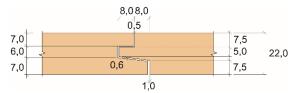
VMG Lignum Board- T&G4 Board, 22 mm. Tongue and groove profiles.
